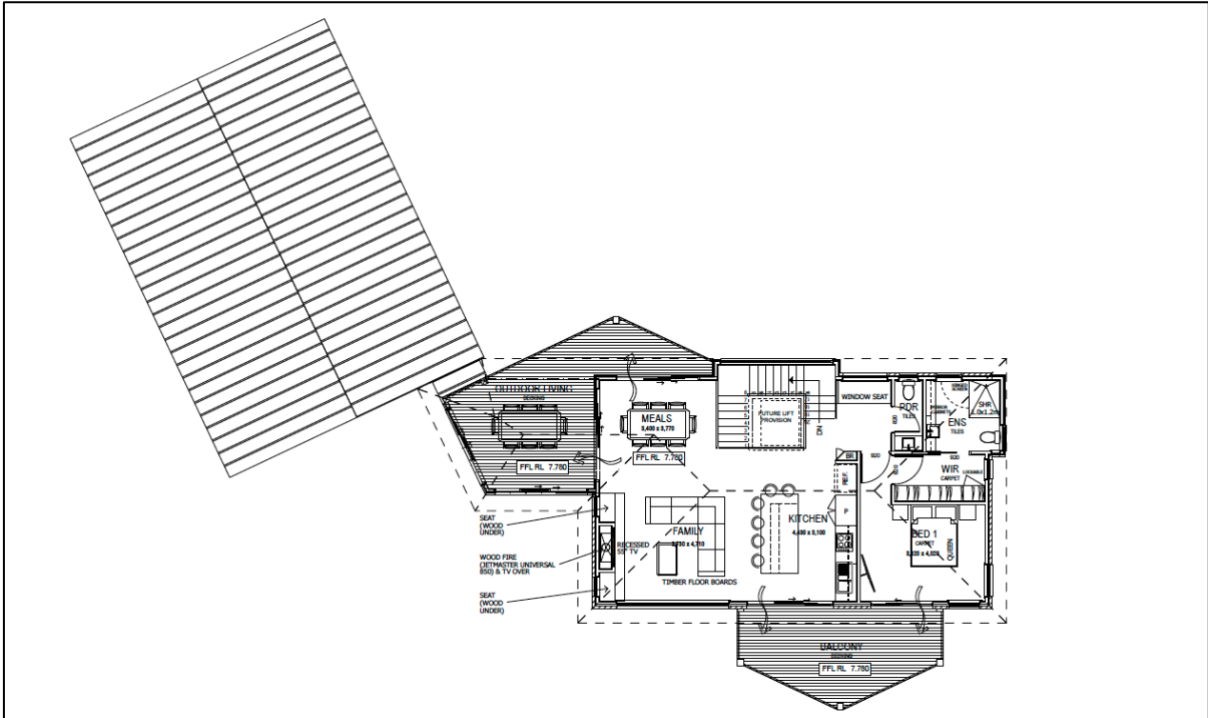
Proposed first floor plan by Peter Jackson Pty. Ltd.
